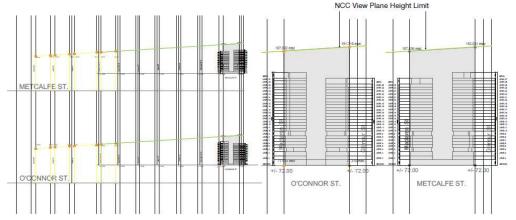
Towers view plane diagram illustrating the towers are well below the NCC view plan height limit.
